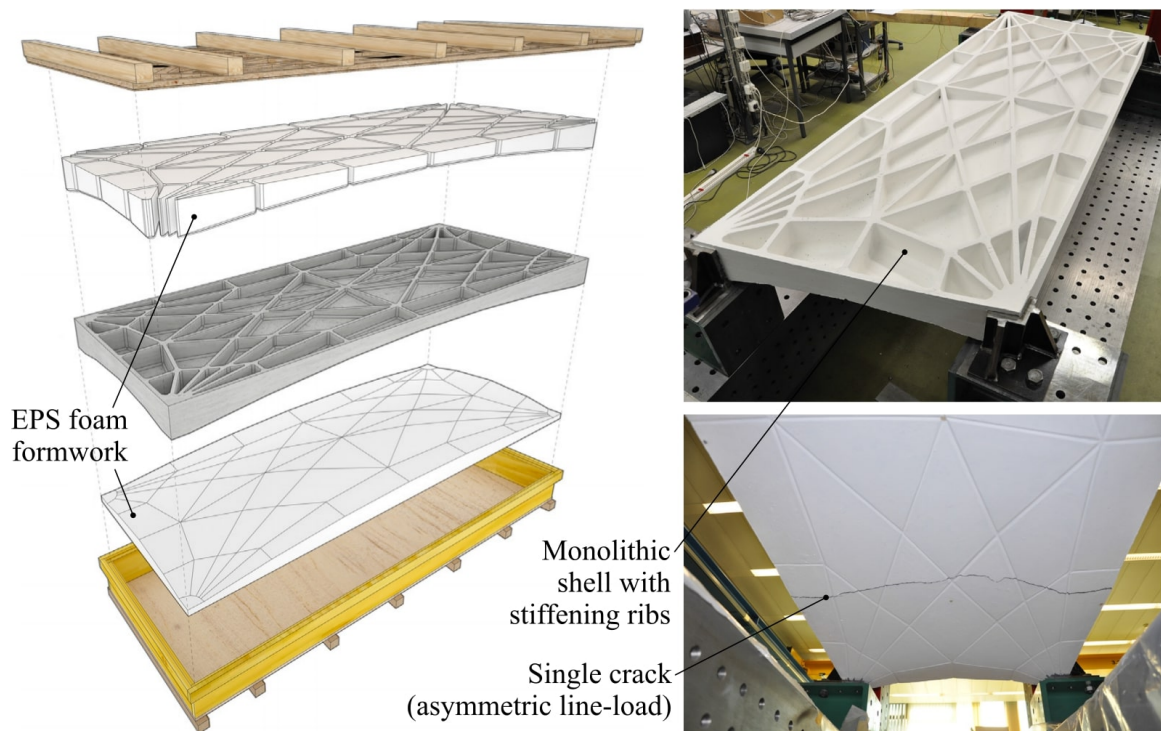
Vaulted, rib-stiffened, pre-cast, fibre-reinforced concrete floor structure developed at ETH Zürich (adapted with permission from Liew et al. (2017)).
